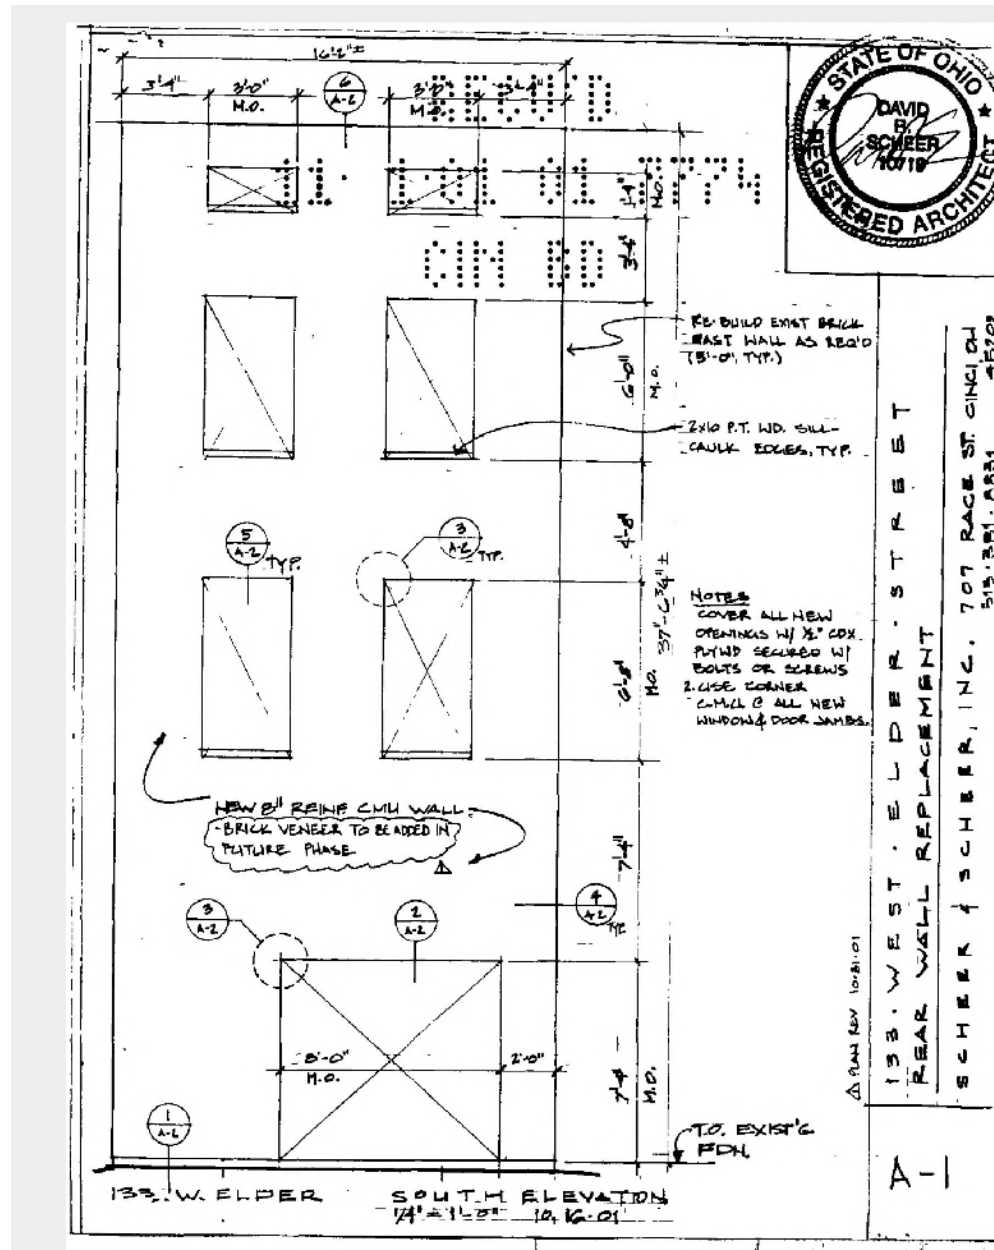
Approved Building/Elevation Plans from permit 2001P07774.
